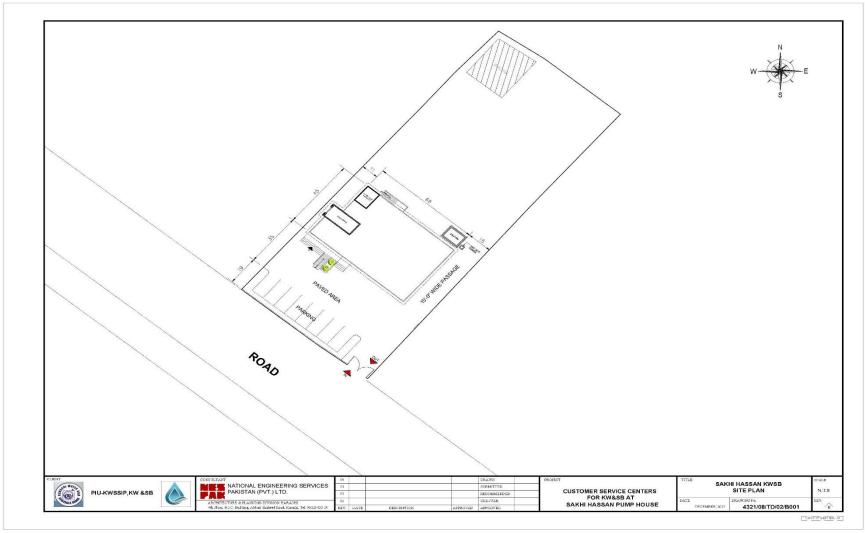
Site Plan for CSC, Sakhi Hassan
